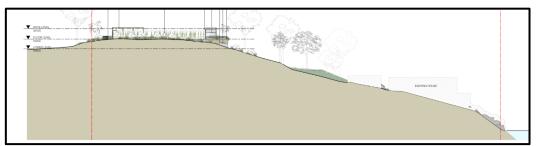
Proposed northern elevation – fixed mesh fence with climbing plants over
